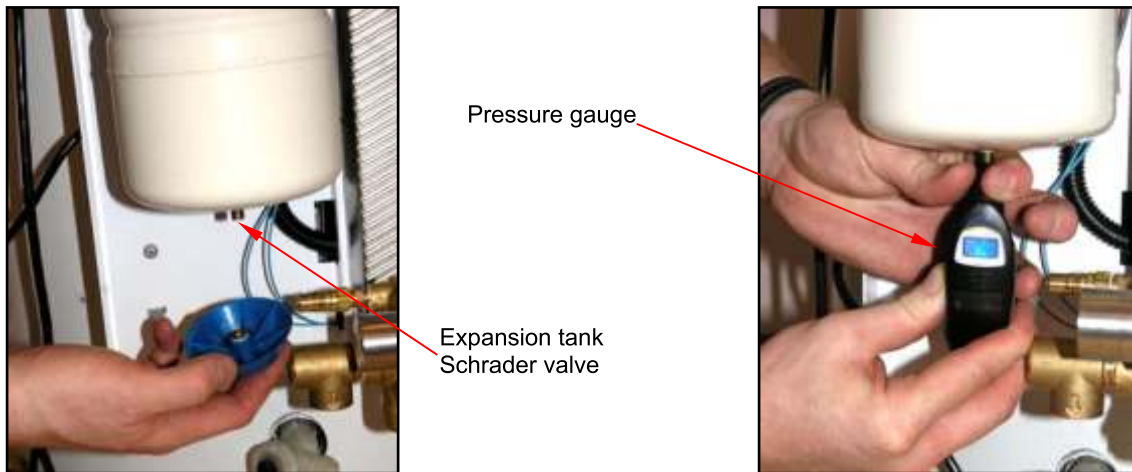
Expansion tank Schrader valve and pressure measurement.
